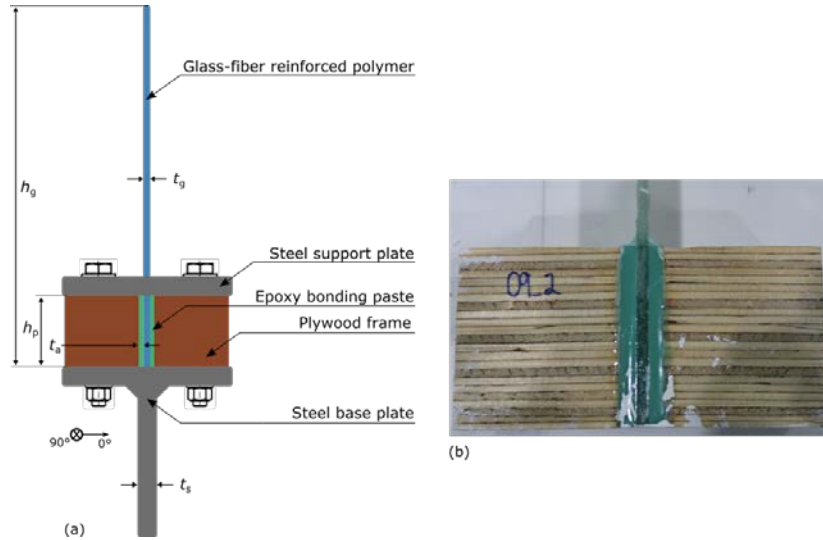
Principle drawing of specimen design with labeled dimensions (a) and actual specimen (b).
